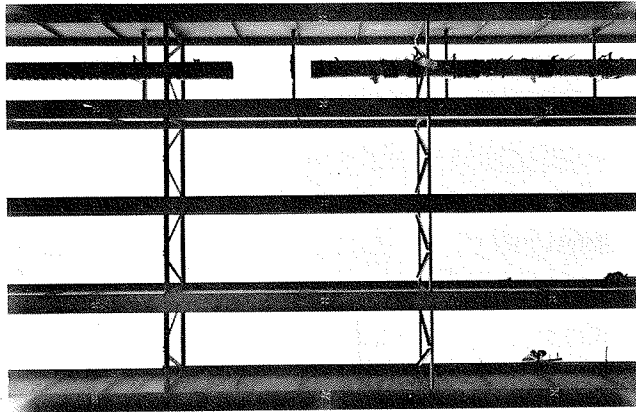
Fifth Street Bridge after placement of steel beams.
